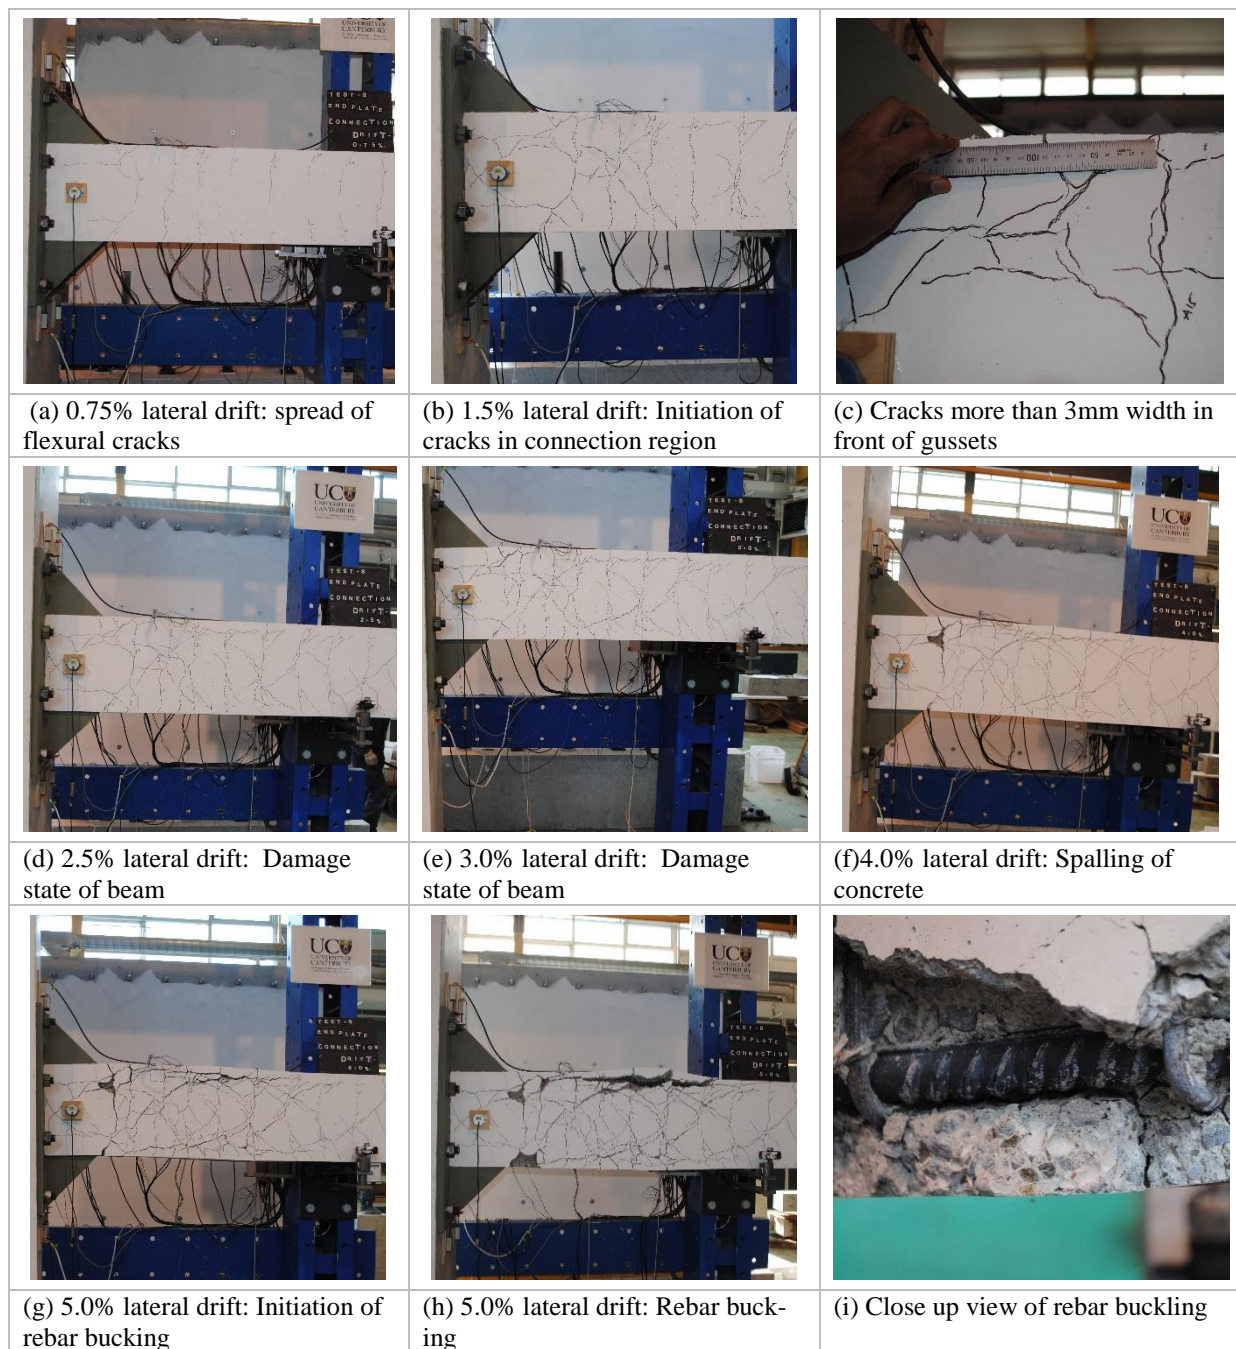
Damage state of the precast concrete beam with end plate connection at different drifts
